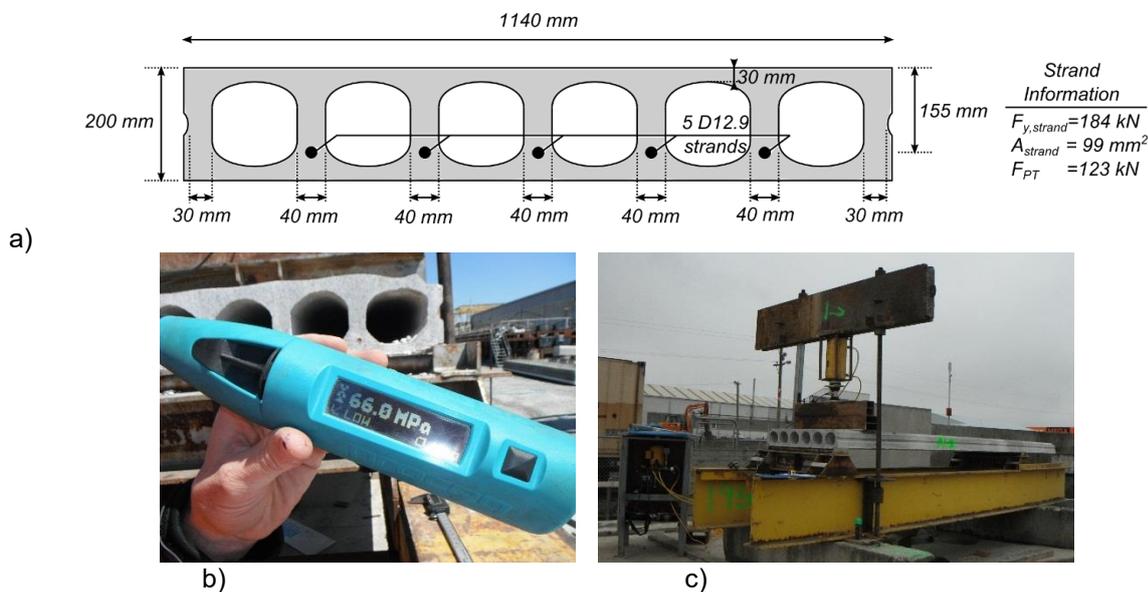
a) Cross section for the test specimens and pre-stress information; b) Digital Schmidt hammer; c) Test specimen placed within the setup
